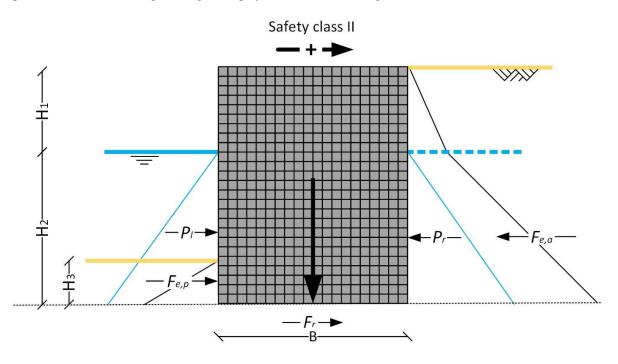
All relevant pressures, forces and dimensions for the failure mechanism 'Sliding'
